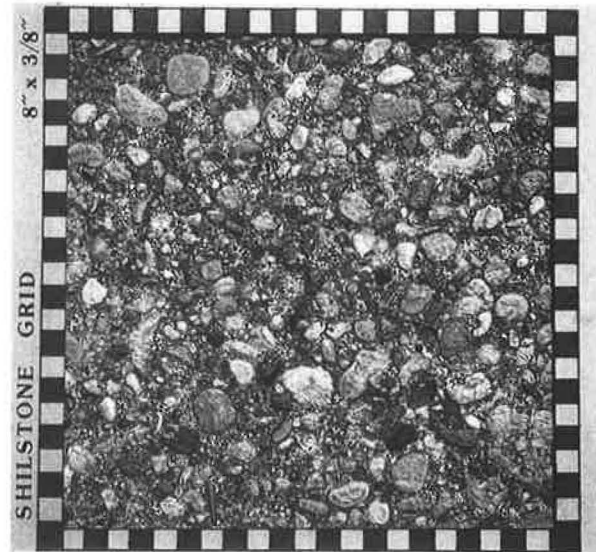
1922 cast concrete pavement with high aggregate density.
